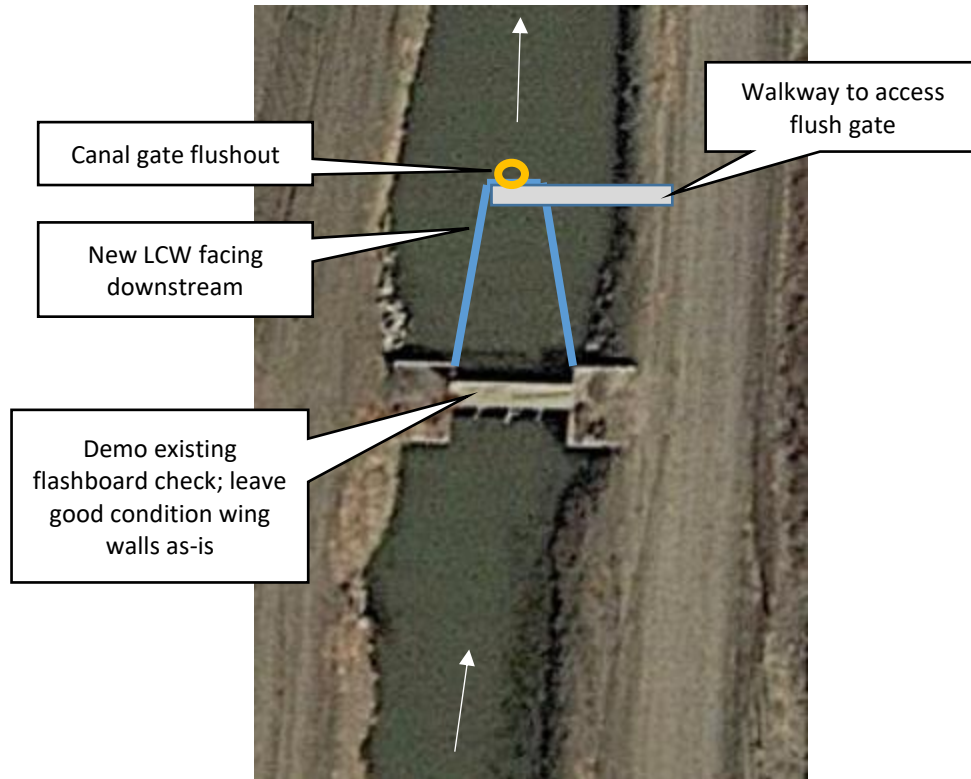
Laguna Canal check structure improvement concept; plan view overlying the first Laguna Canal check
